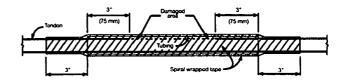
Restored Sheathing on a Damaged Tendon
